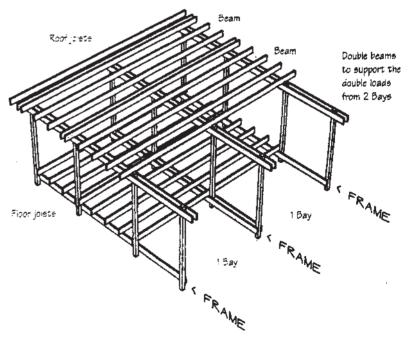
Flat roof frames on the Lewisham self build house (1980)
